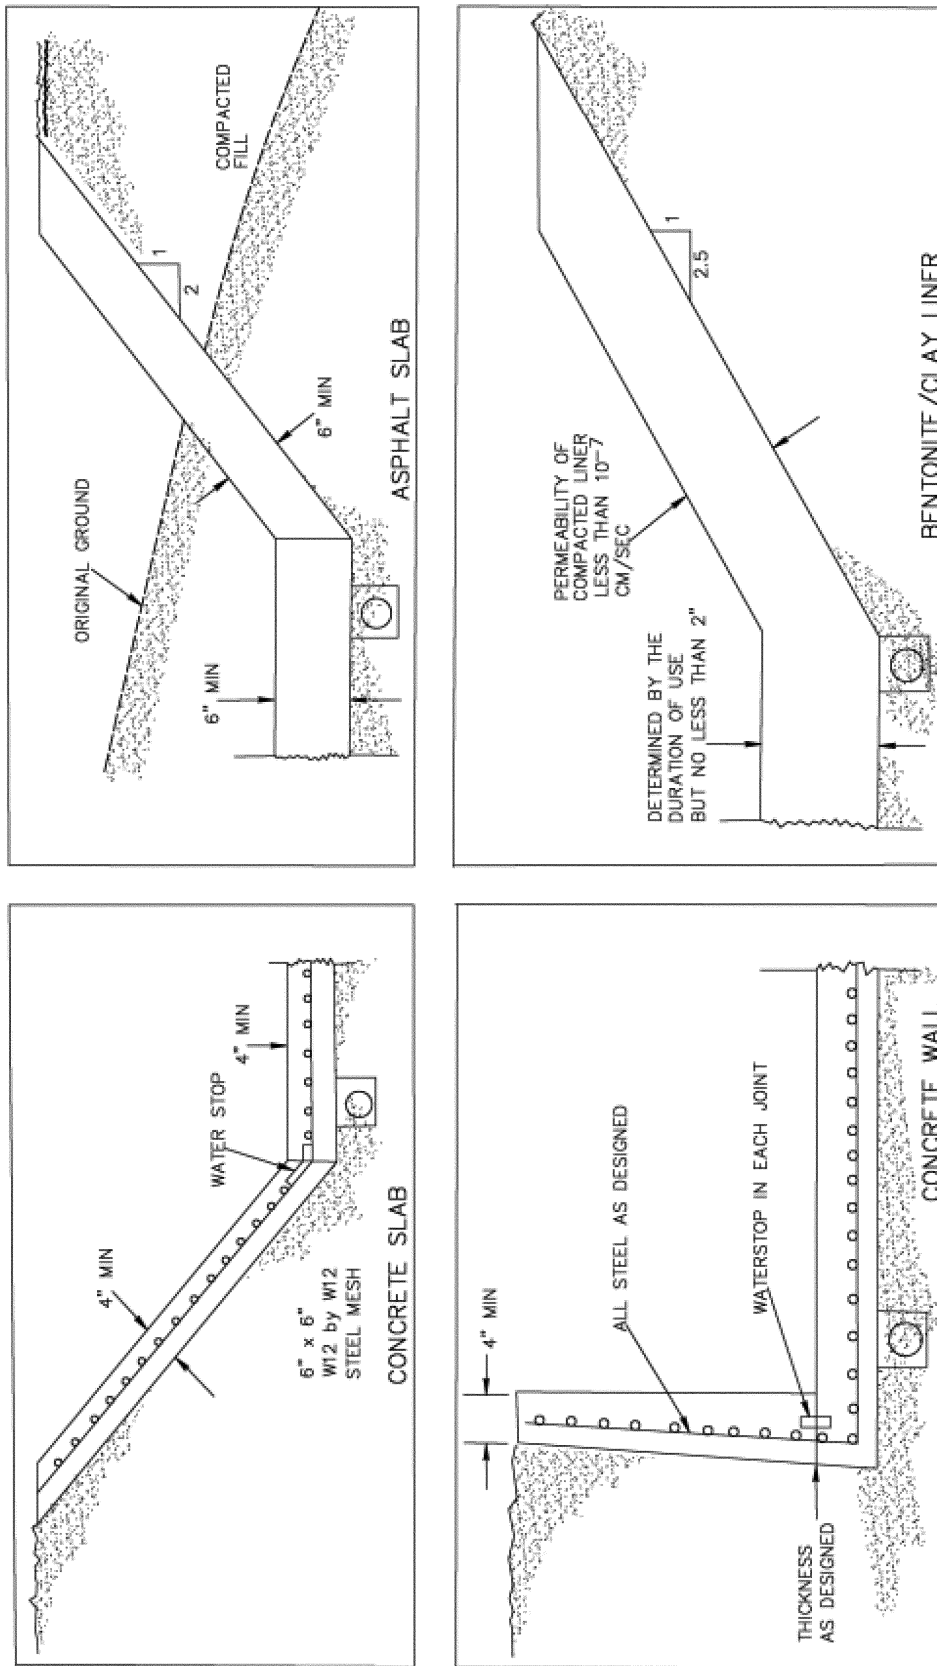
EXAMPLE OF ACCEPTABLE DESIGN FOR CONCRETE, ASPHALT AND BENTONITE/CLAY LINERS
